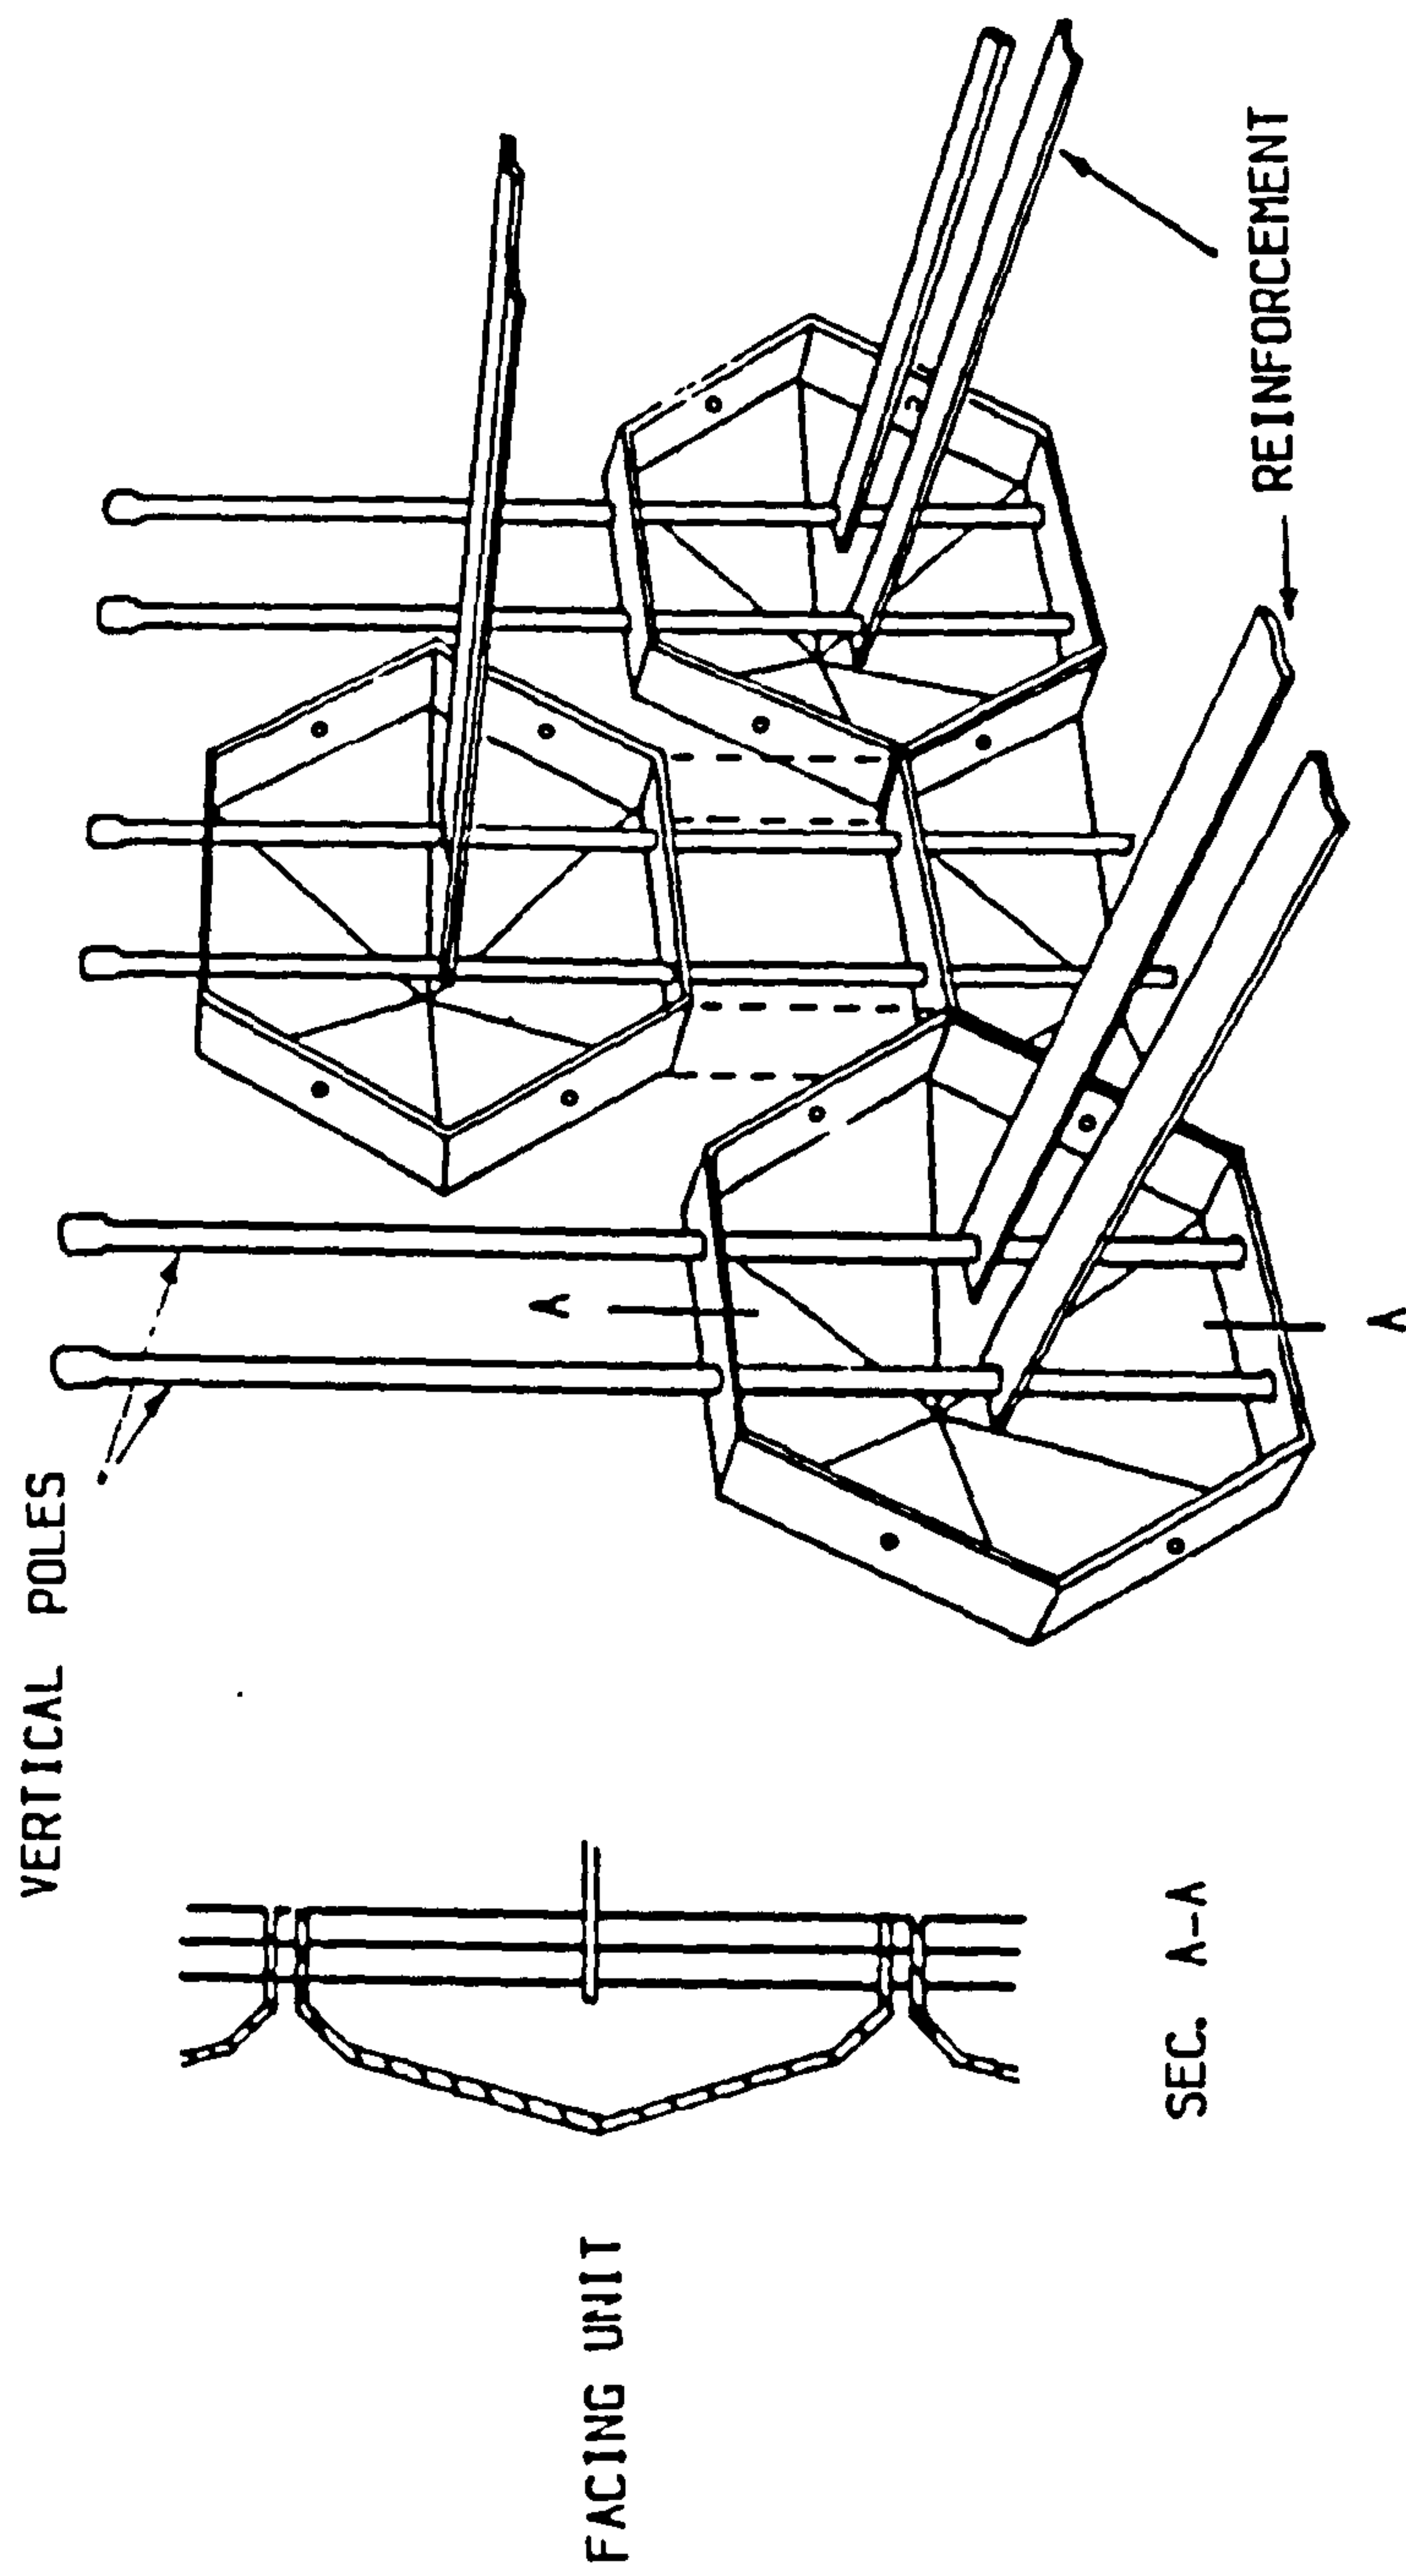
D.O.E. SYSTEM OF REINFORCED EARTH RETAINING WALL (AFTER JONES, 1977).
